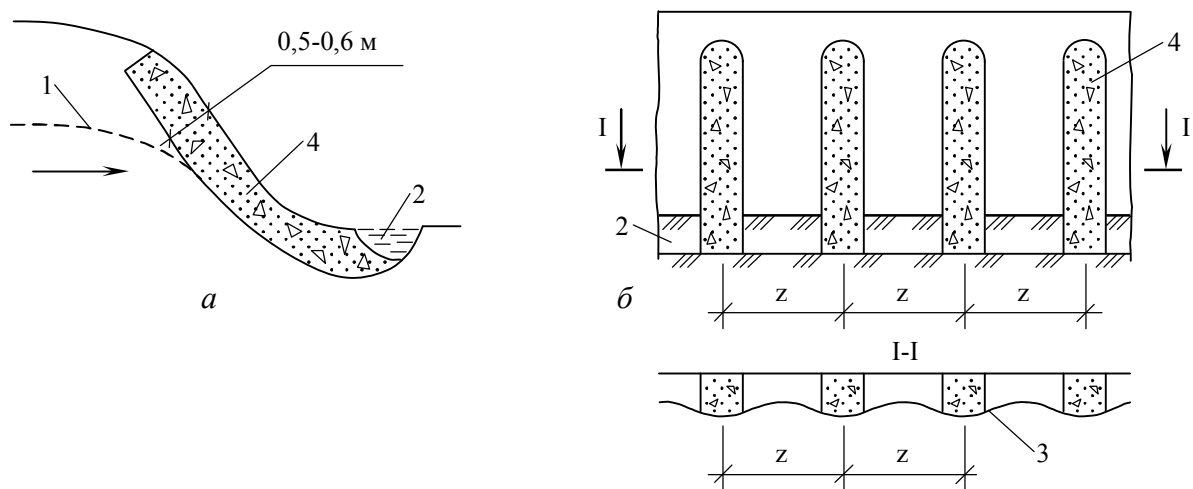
Scheme of sloping drainage: a – cut; b – plan; 1 – level of ground water; 2 – spillage; 3 – reduced water level; 4 – gravel
